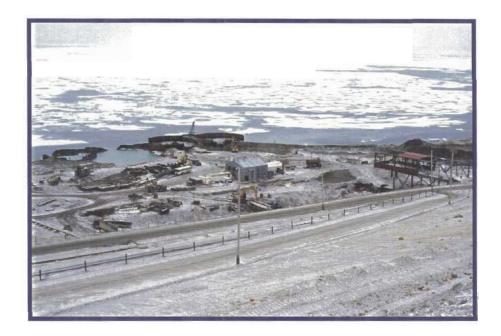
View of dock cell area after night of high (120 km/hr) winds. Note flooded cells with more damage to sheet piles.
